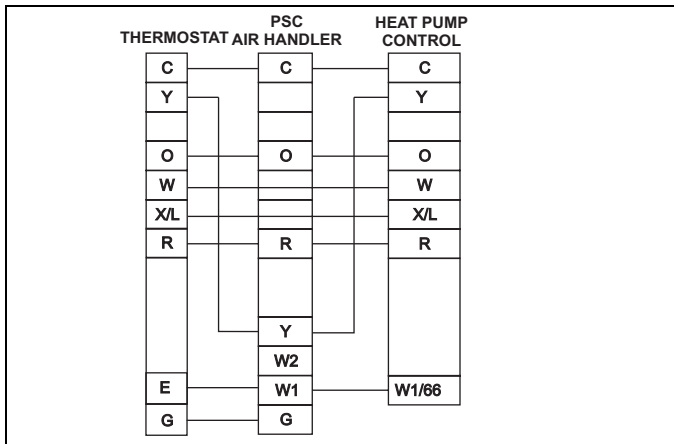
Typical Air Handler Conventional Heat Pump Thermostat Wiring
